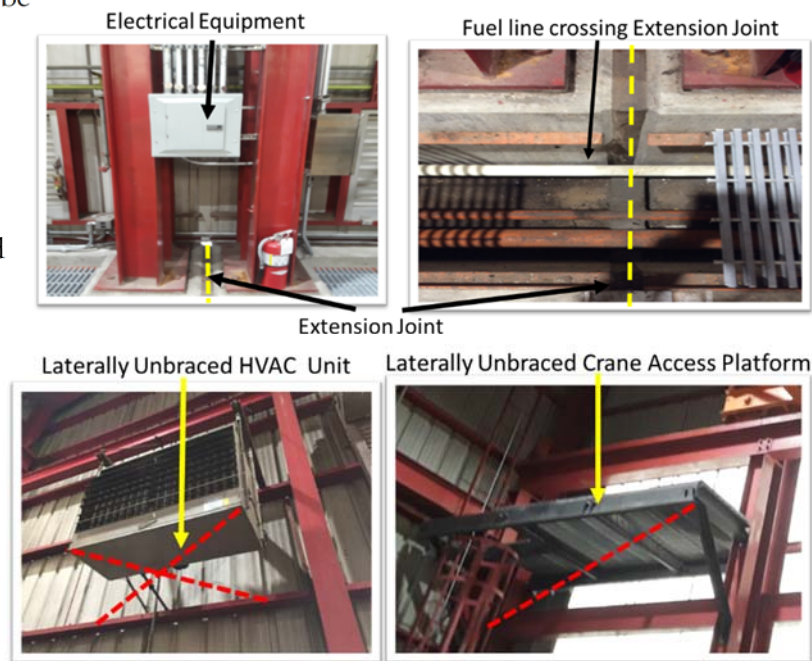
Retrofit Recommendation of Non- Structural Elements within Pumphouse (top: electrical equipment (left) and fuel lines (right) cross extension joint; bottom: unbraced HVAC unit (left) and crane access platform (right))
